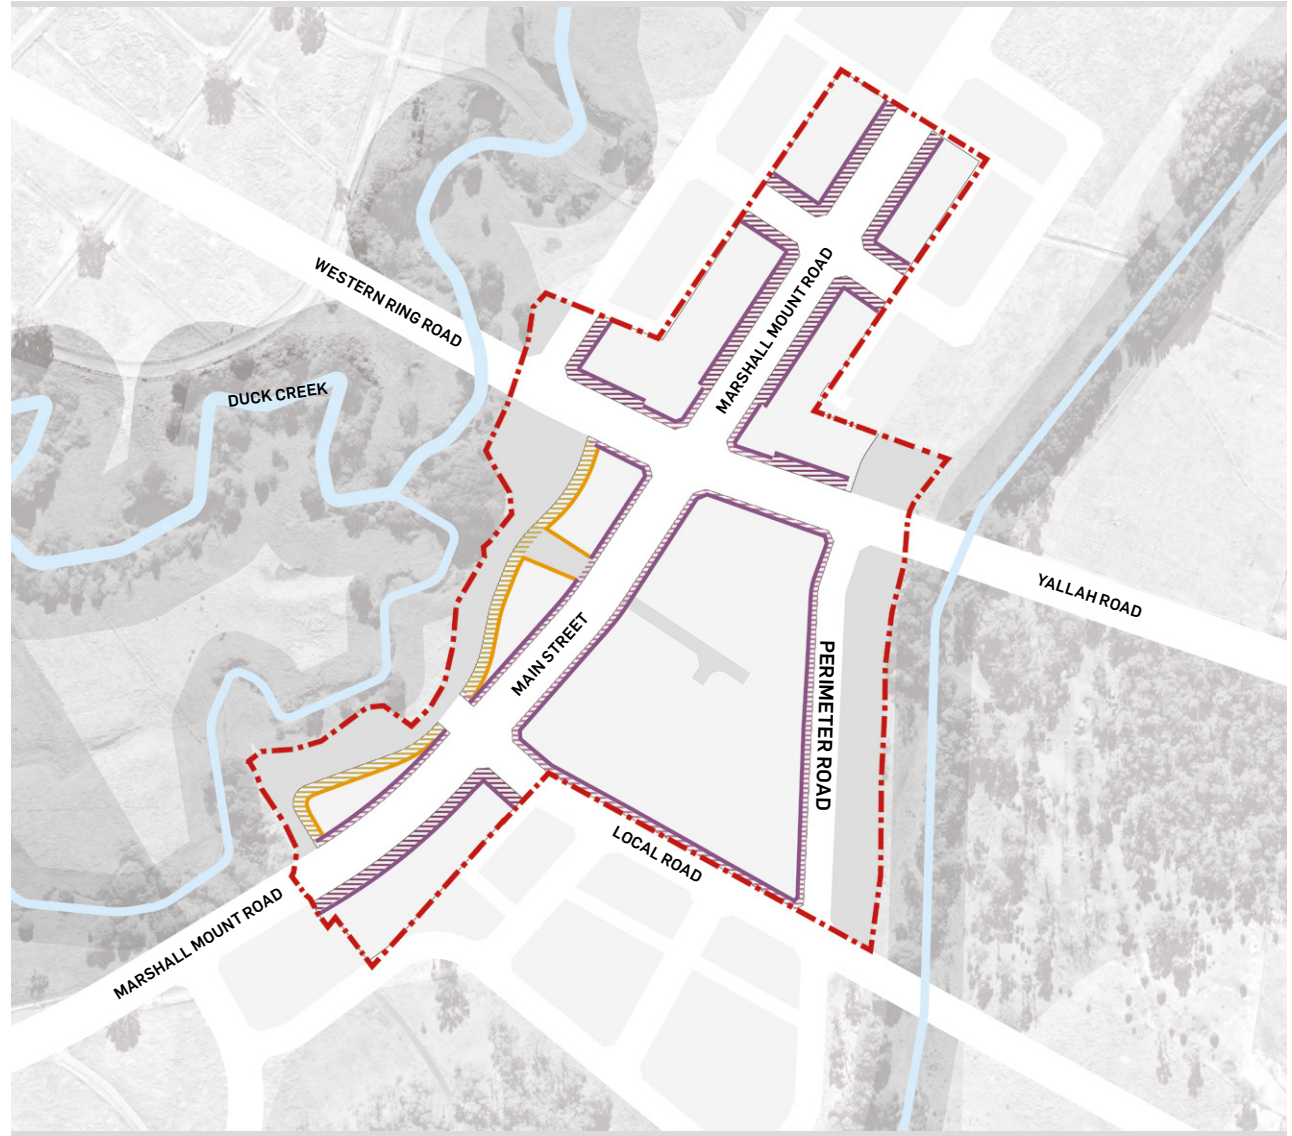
Marshall Mount Town Centre - Indicative Building Setbacks
